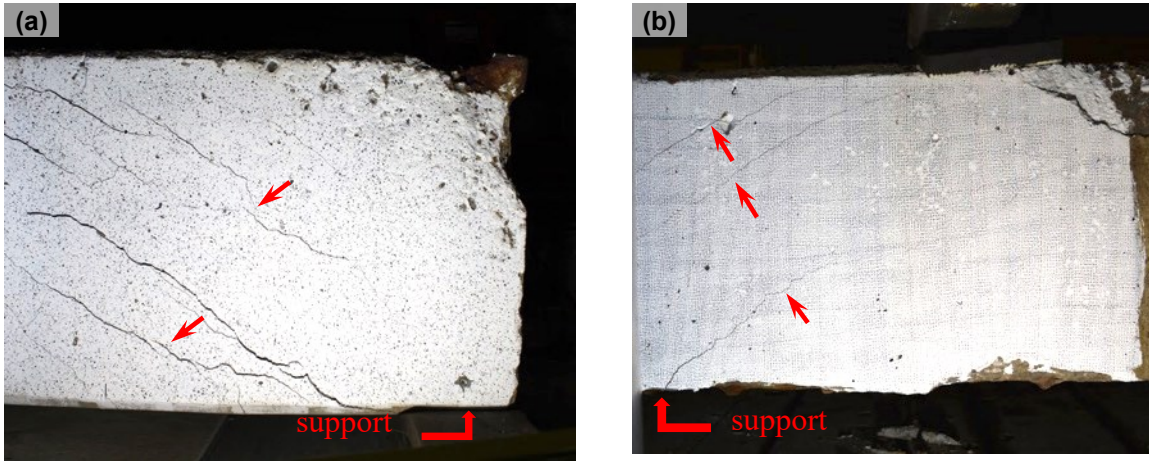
20: Strut formation on shear girders with diagonal cracking indicated with arrows (a) Girder LD-1 (b) Girder HD-1.
